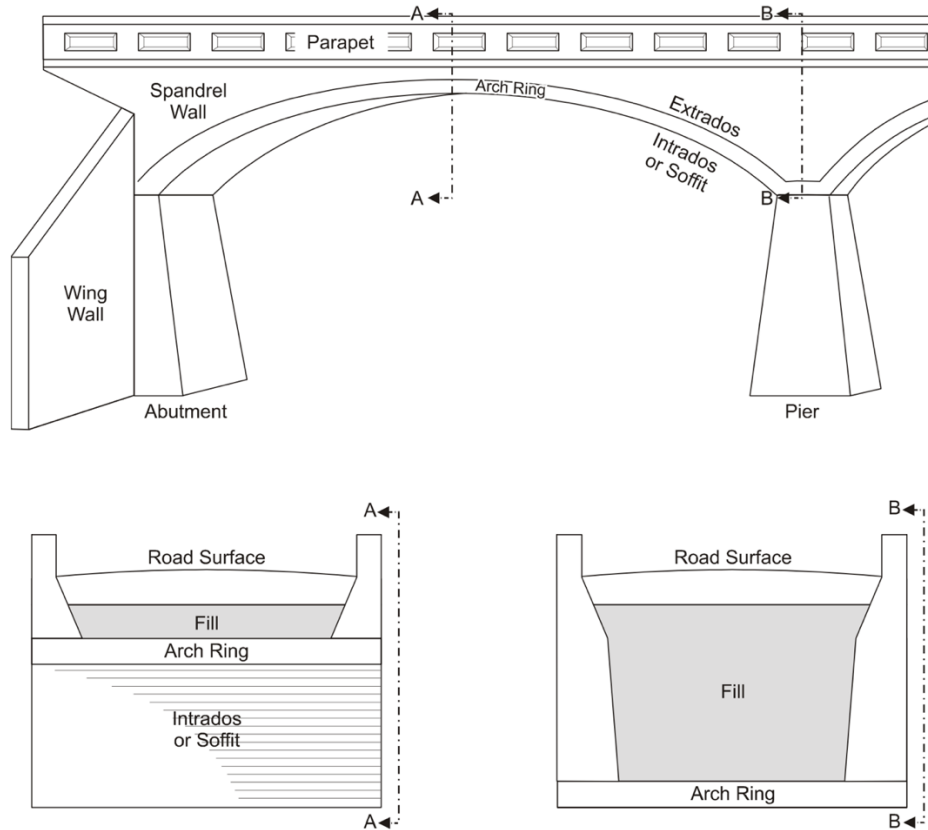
“Illustrations with Arched Bridge Terminology.” Source: Miller, Clark, & Grimes, “Survey of Masonry and Concrete Arch Bridges in Virginia,” 8.
